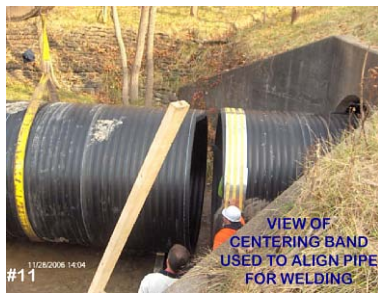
Aligning two pipe sections before welding (D. A. Van Dam, 2008)
